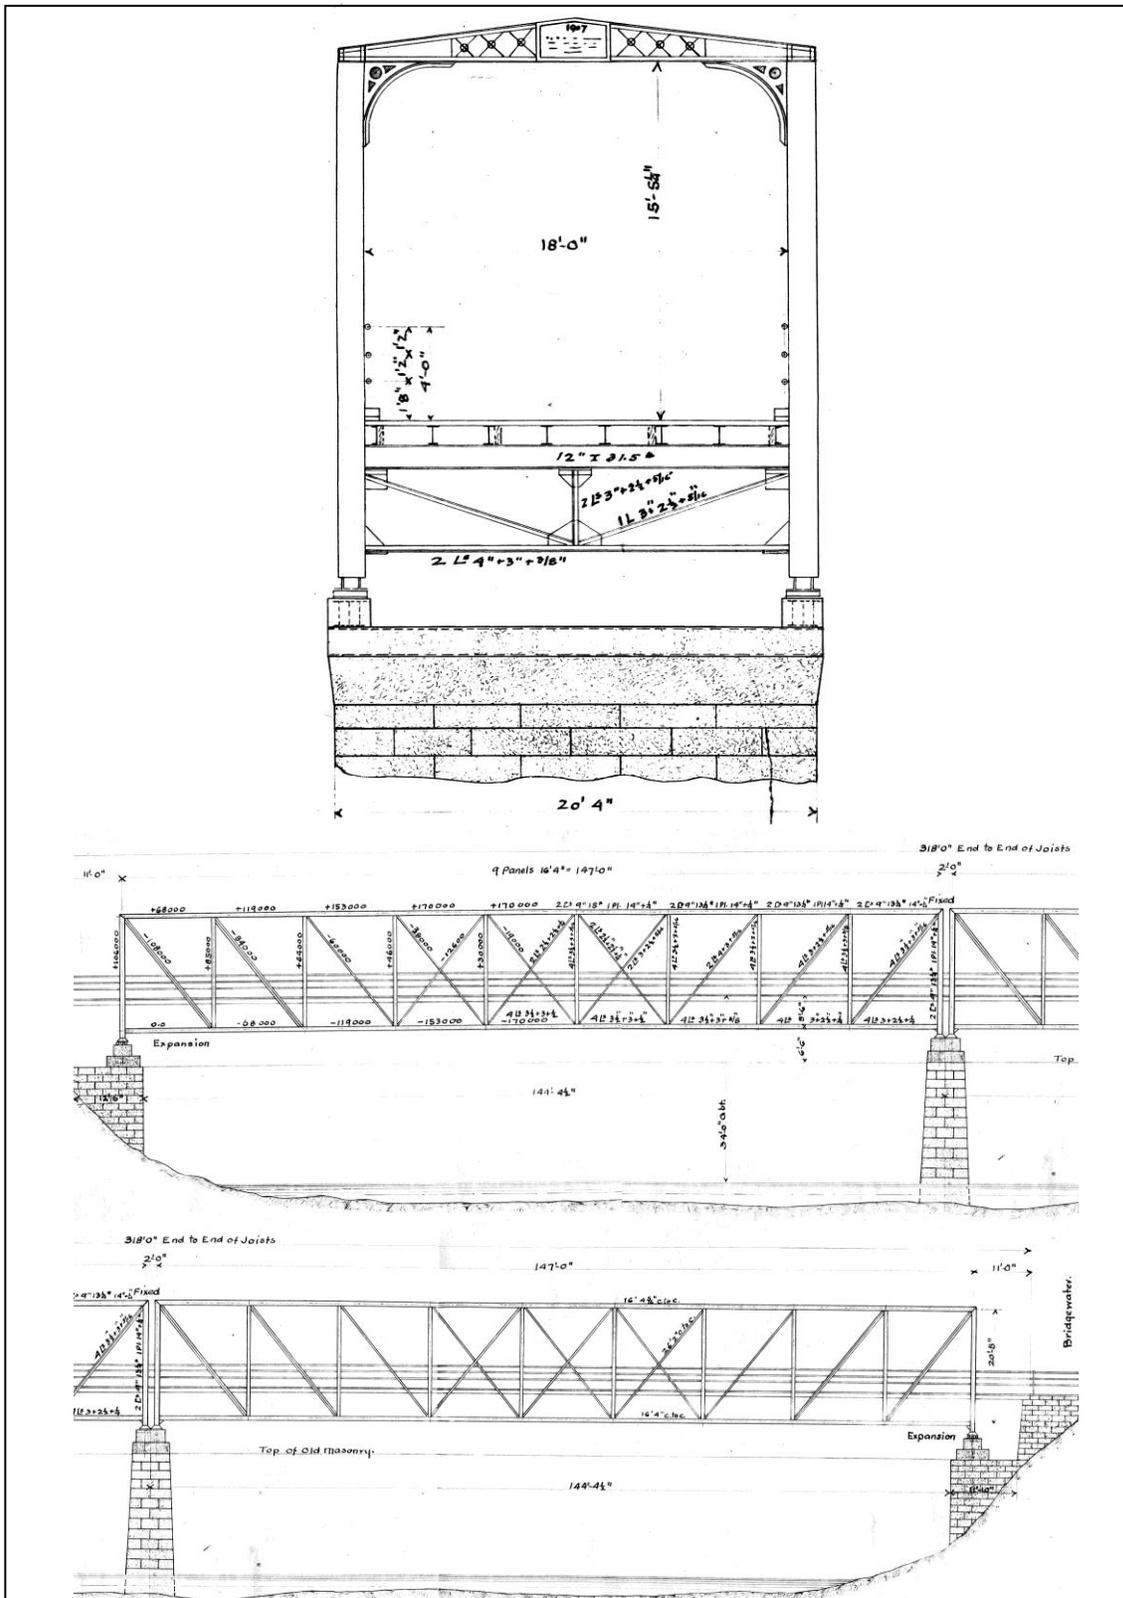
Ashland-Bridgewater, 076/080 over Pemigewasset River. An uncommon two-span, half-through, Pratt truss with vertical end posts. Designed by John Storrs and built by United Construction Co. in 1907. Replaced in 1937. Original plan drawings by John Storrs, 1907 (NHDOT Plan files).
